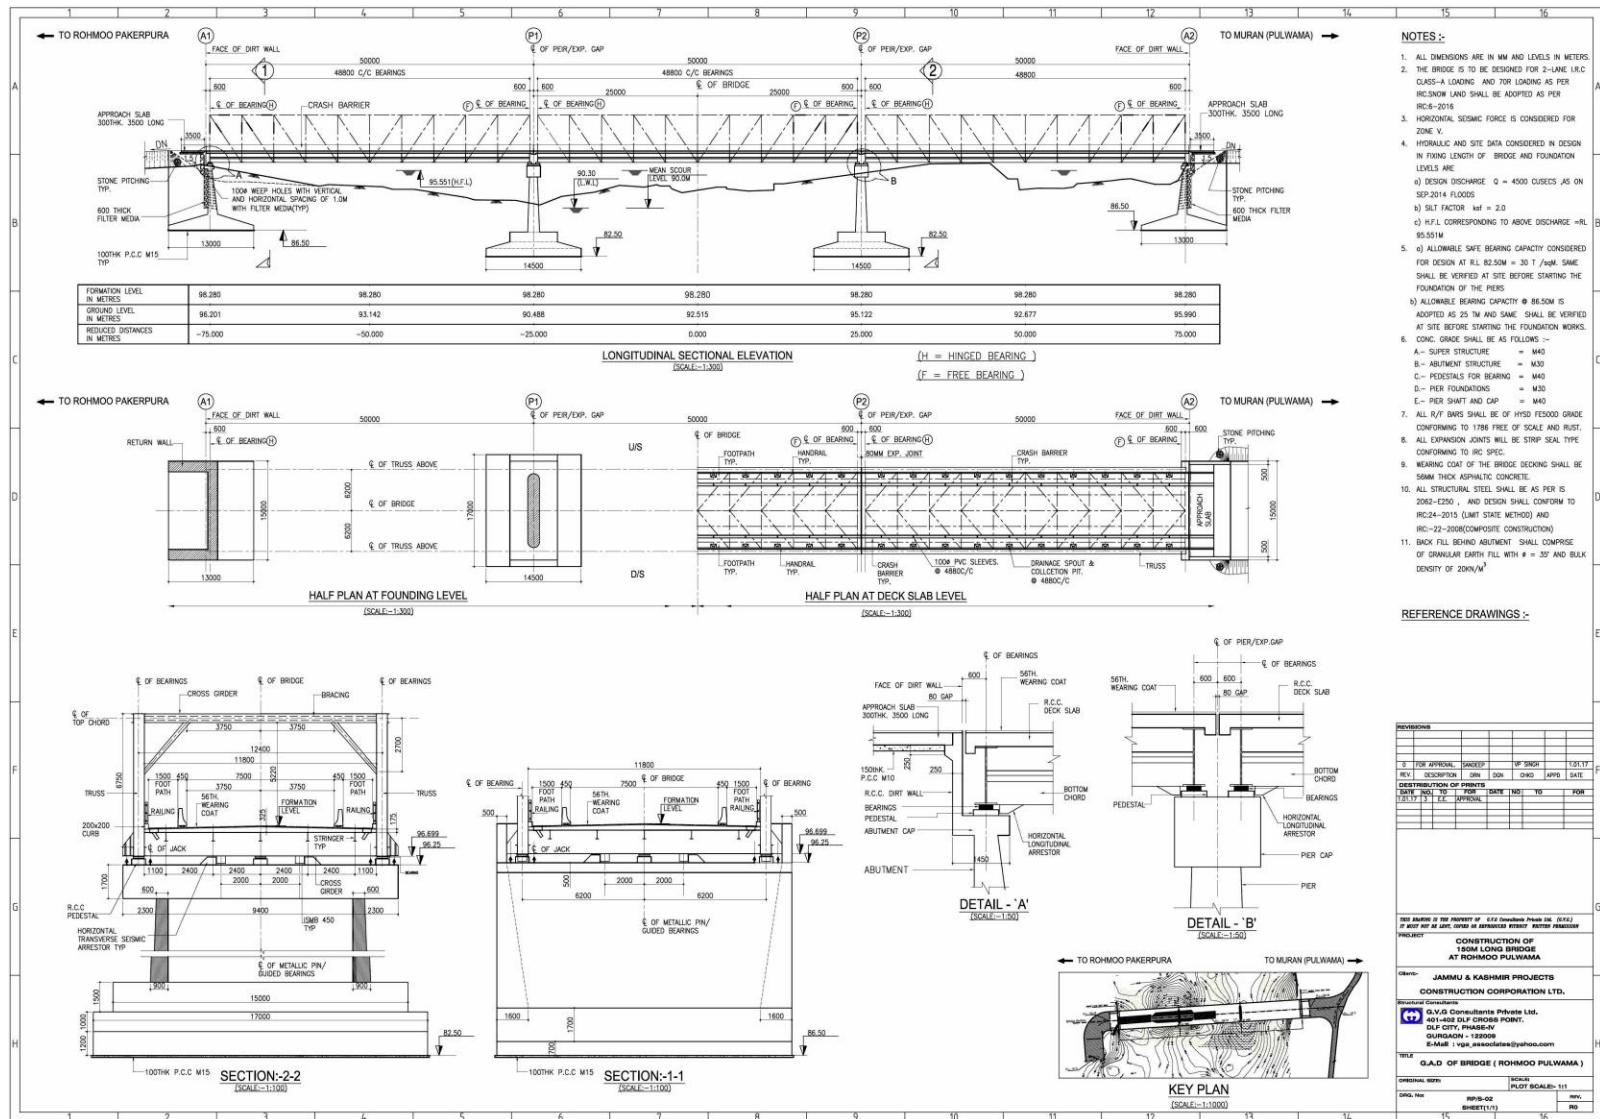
General Arrangement Drawing (GAD) for Proposed Bridge at Rohmoor
